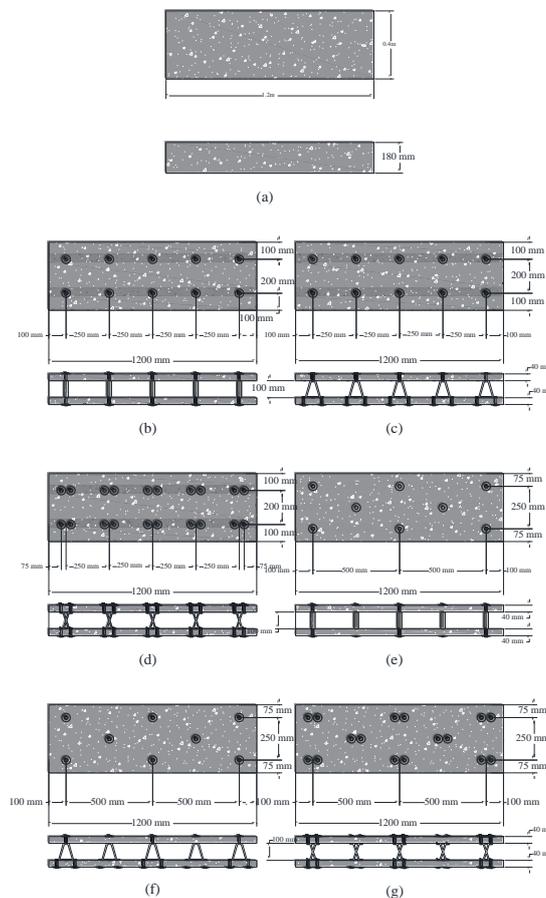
Schematic Sketch of Top and Side View for: (a) PLCS (b); PLCSS-IC-10; (c) PLCSS-VC-10; (d) PLCSS-XC-8; (e) PLCSS-IC-8 ; (f) PLCSS-VC-8; (g) PLCSS-XC-8
